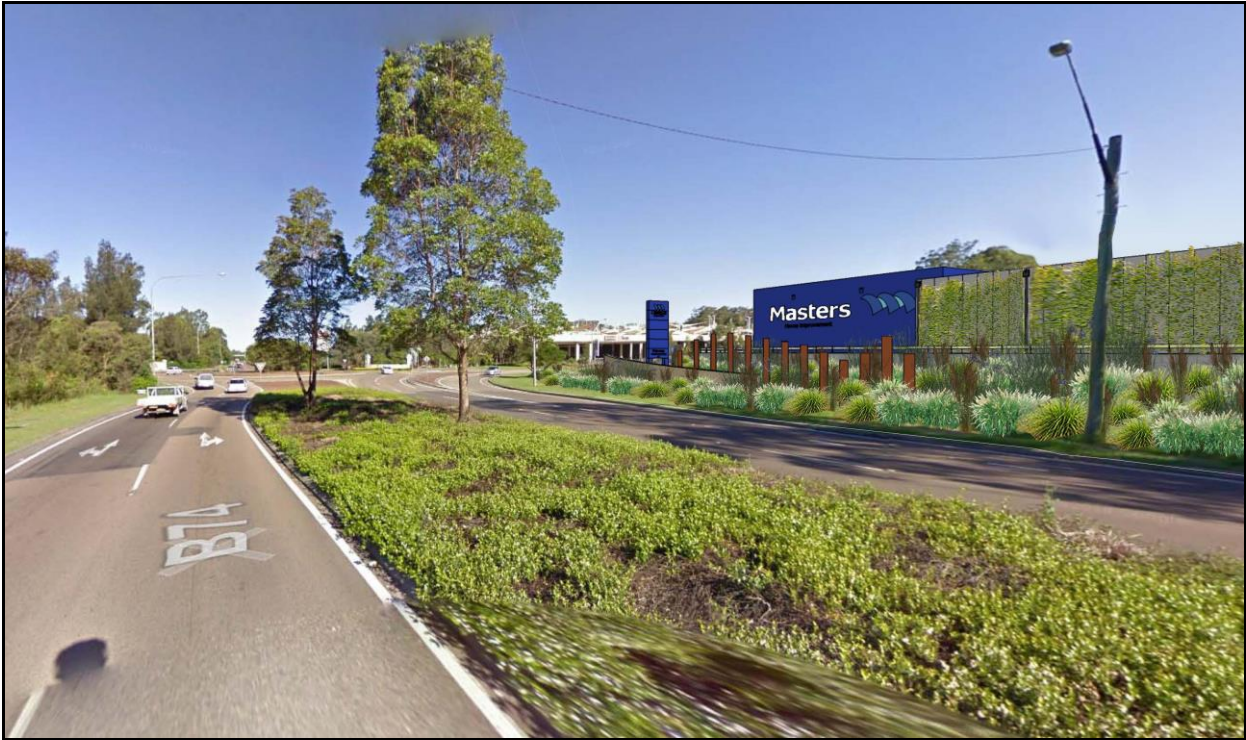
Photomontage looking west to the Wyong Road/Tonkiss Street intersection.
